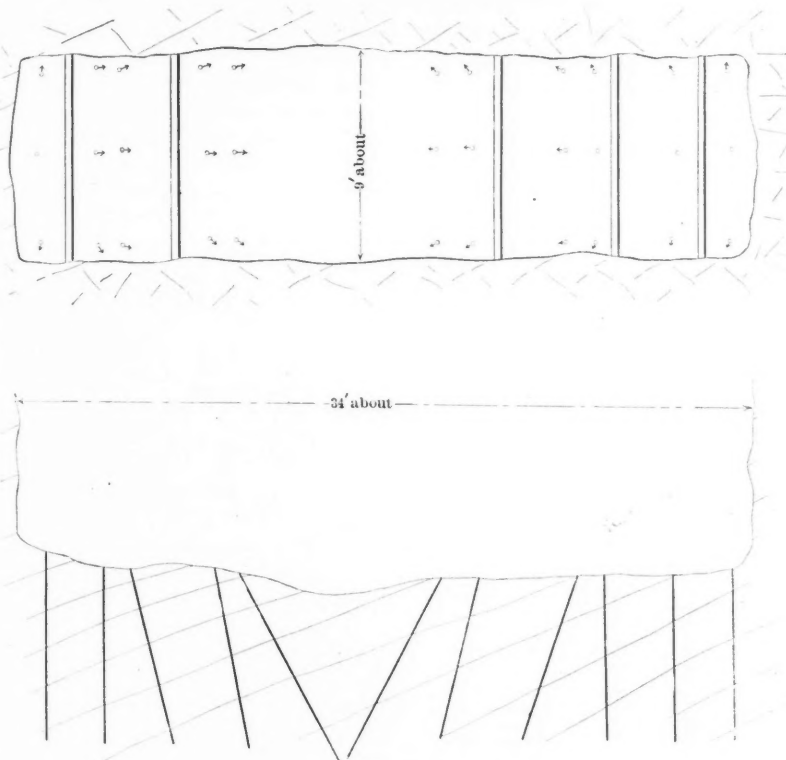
SECTION AND PLAN, NO. I SHAFT, RAND COLLIERIES, LTD., SHOWING POSITION OF DRILLING BARS AND ARRANGEMENT OF DRILL HOLES
